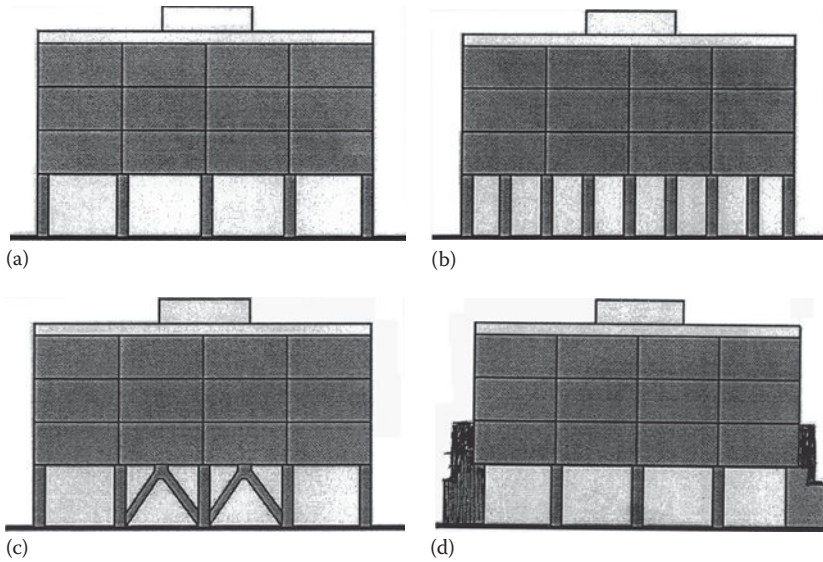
Design solutions for soft-story condition: (a) soft-story condition, (b) add columns, (c) add bracing, and (d) add external buttresses.
